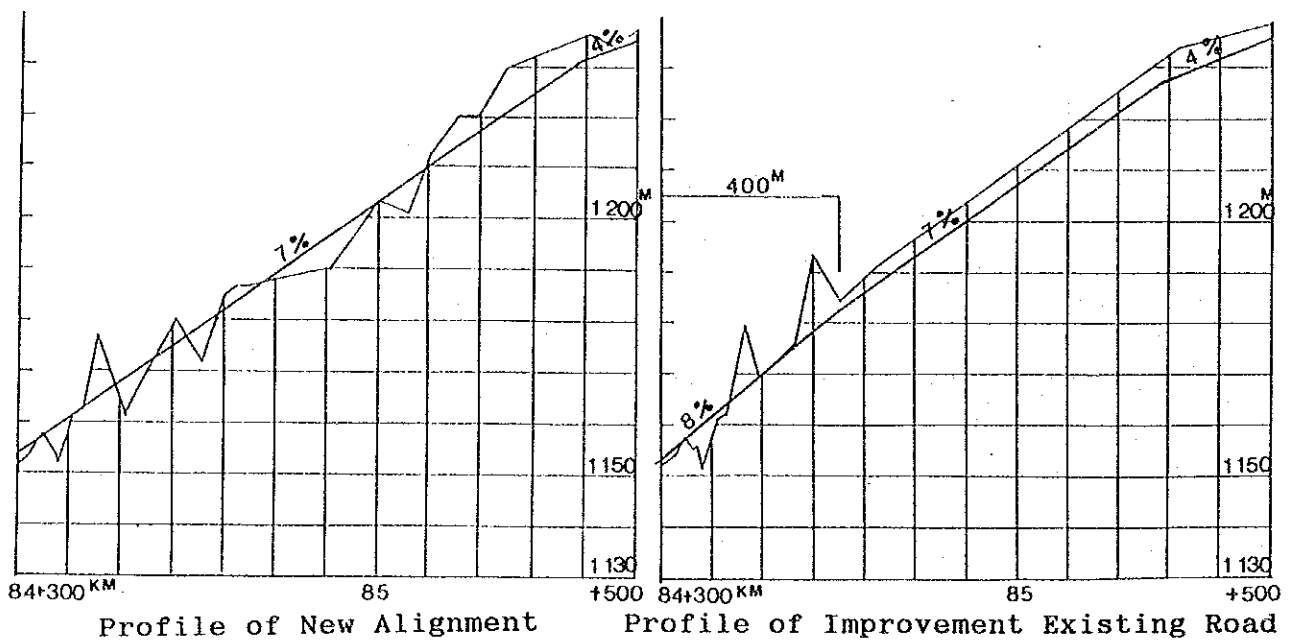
Profile of Alternatives at Point(Q)+5Km
